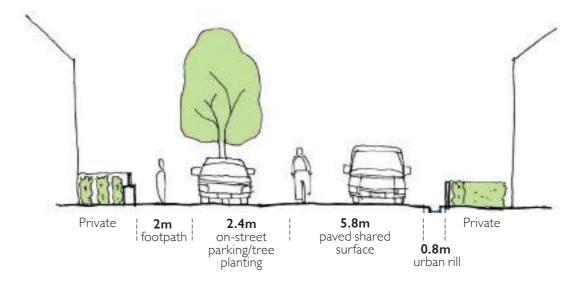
Example Tertiary Street section with shared surfacing $\,$
